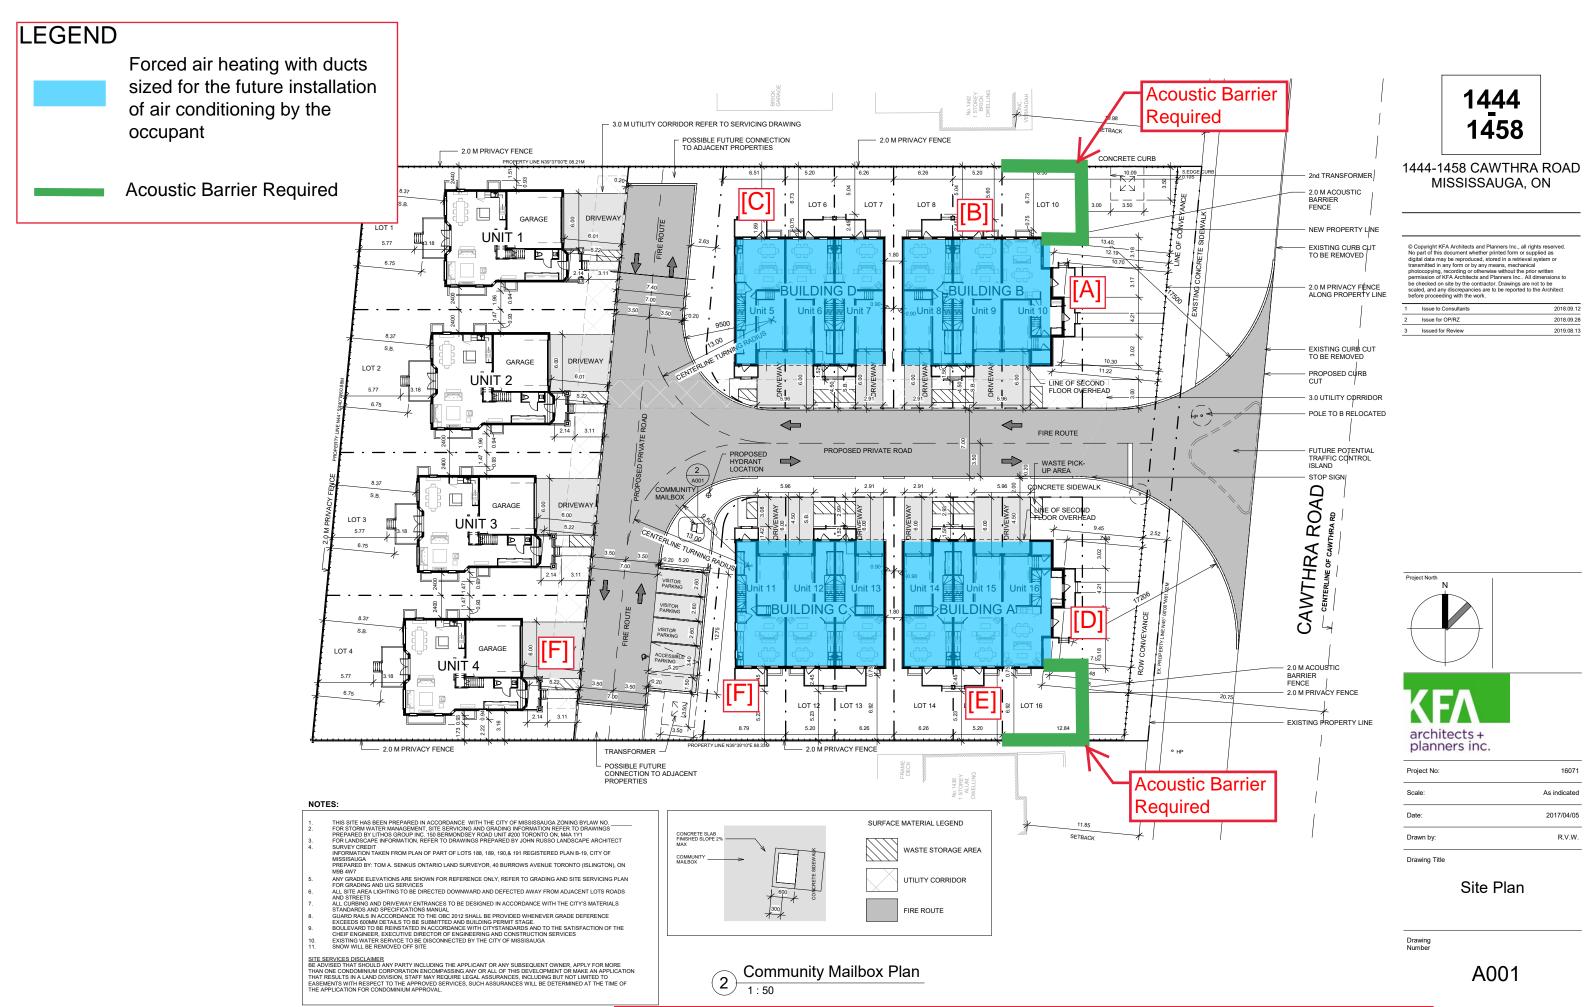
Proposed Site Plan Showing Ventilation and Barrier Requirements
